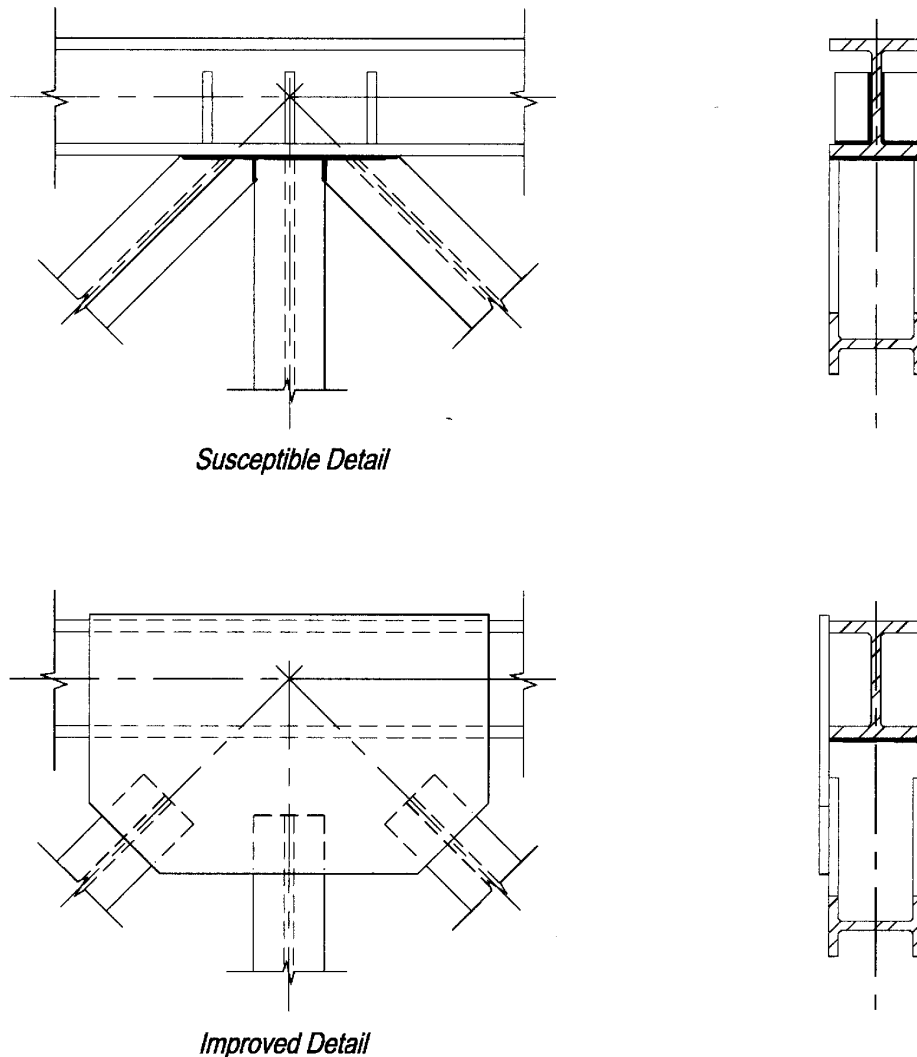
Susceptible and improved details to avoid intersecting welds with high restraint.
